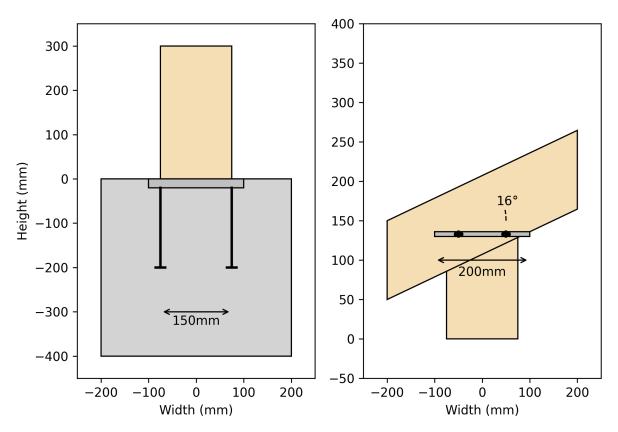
Detailed specifications of critical structural connections and assemblies. The column-foundation connection utilizes a  $200\times200\times10$ mm base plate with M16 grade 8.8 anchor bolts. The roof-column connection implements 6mm steel plates with M12 grade 8.8 bolts for secure joining of C27 timber members.
